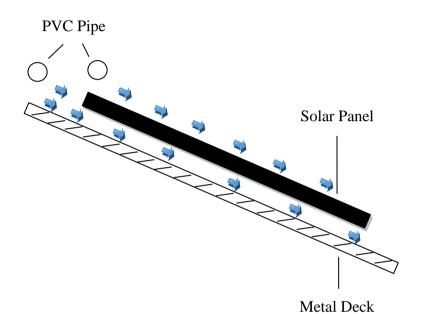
Cross Section View of PVC Pipe Drip onto the Solar Panel
